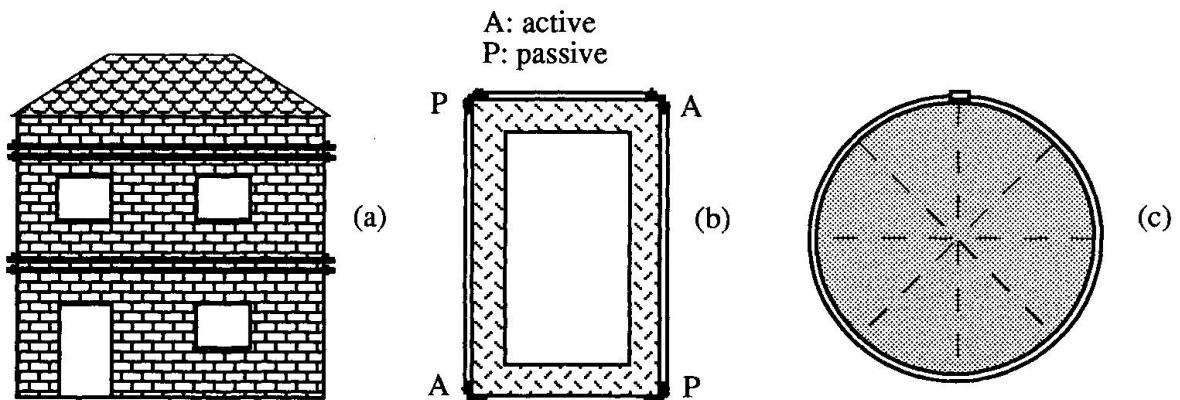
Application of external FRP ties: (a) elevation; (b) plan view of rectangular structure; and (c) plan view of spherical dome.
